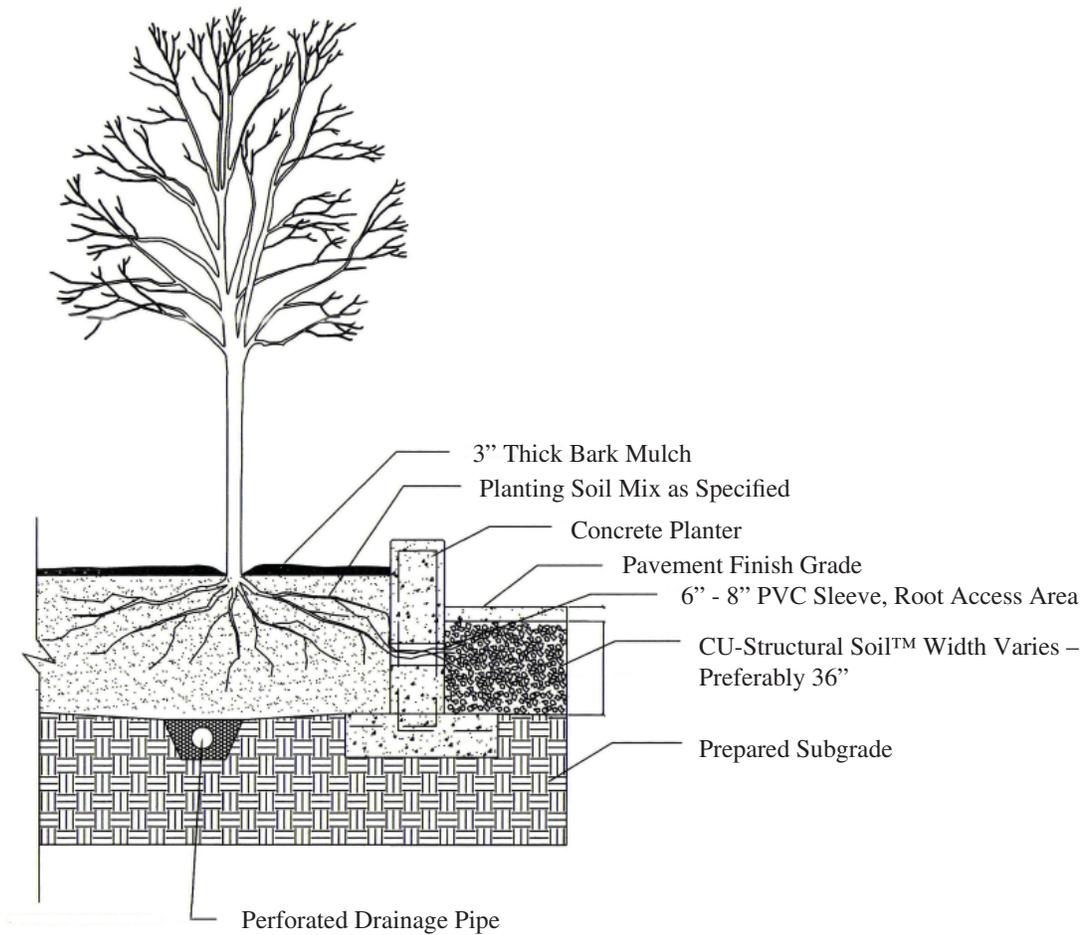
Limited soil volume planter with root access into CU-Structural Soil™ under plaza pavement
